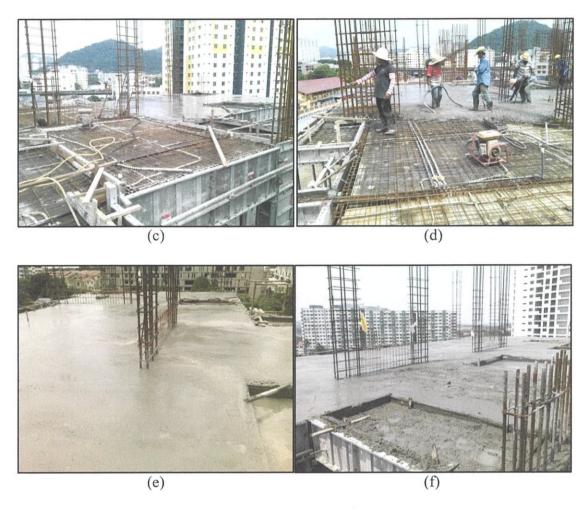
(c-f): Concreting Work at 4th Floor Slab/ Beam (Unit 9 and Unit 10)
